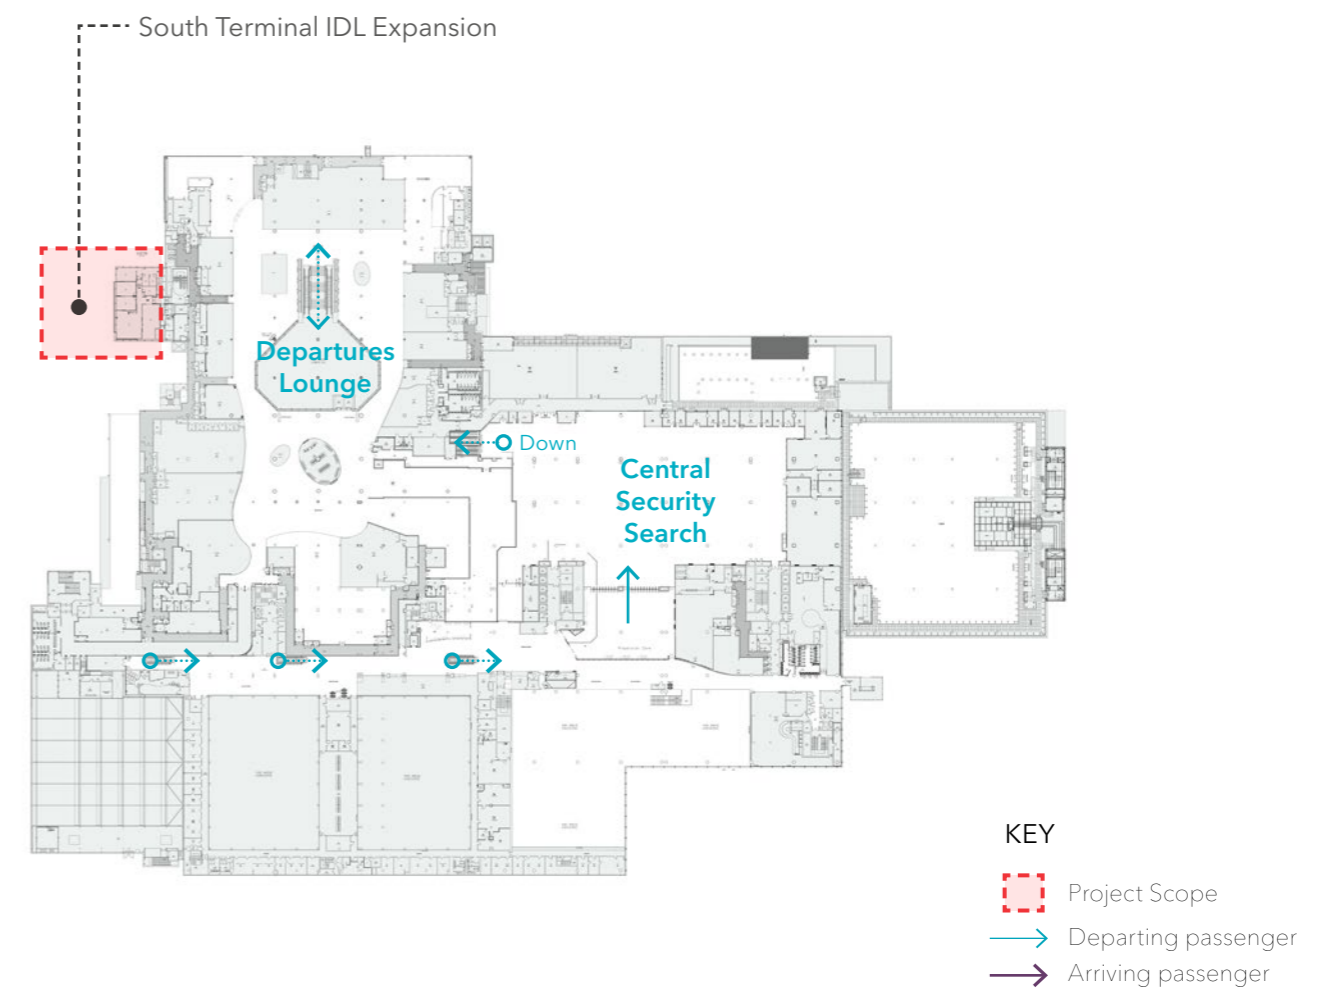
Terminal Plan Level 30 (Upper Departures Level)
